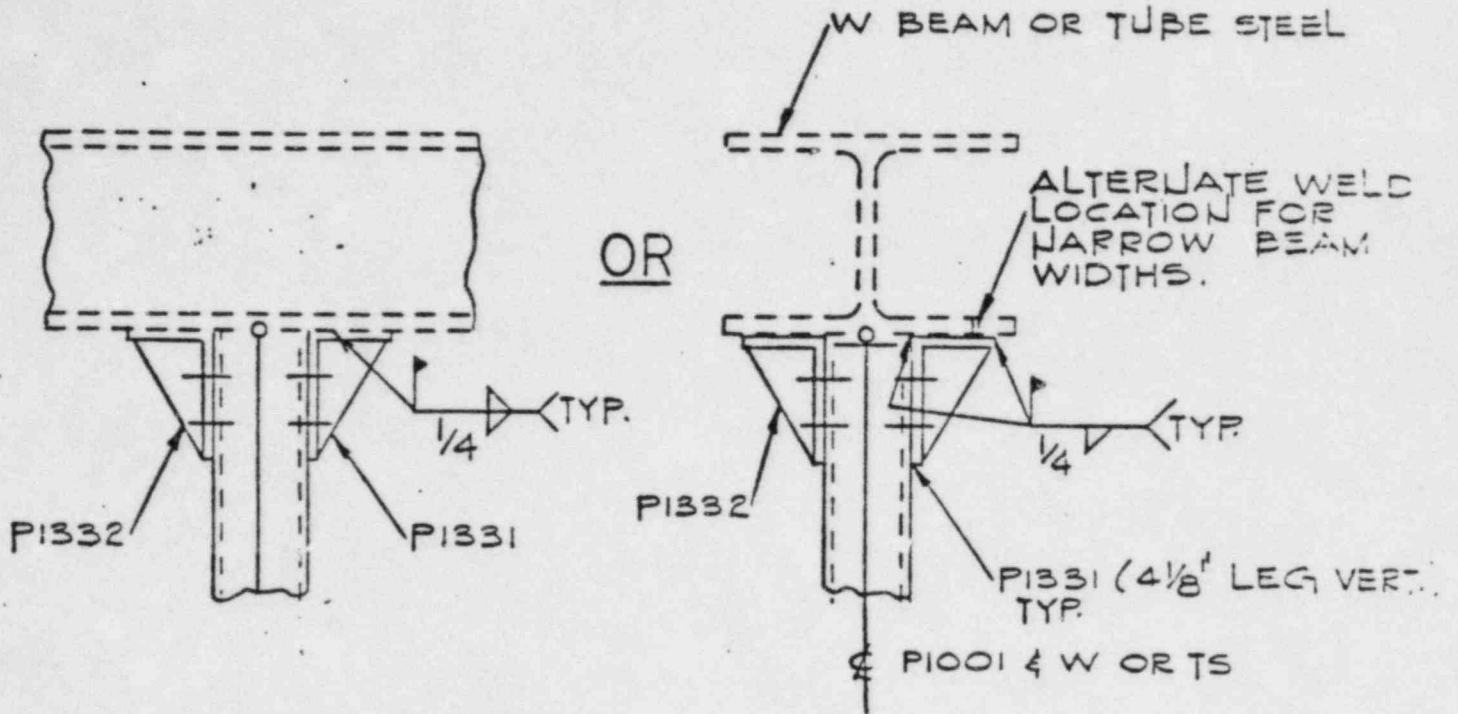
TYPICAL VERTICAL HANGER CONNECTION
